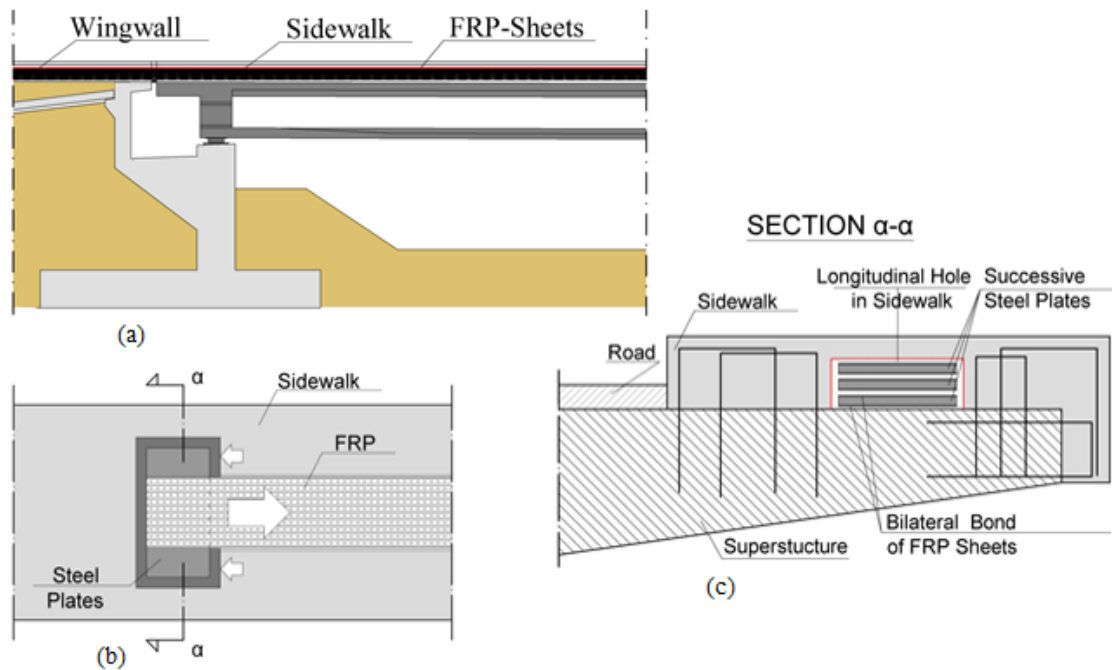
Schematic views of the FRP Restraining System. a) Elevation view abutment - outer span, b) Plan view sidewalk detail, c) Detail of the cross section of the deck
